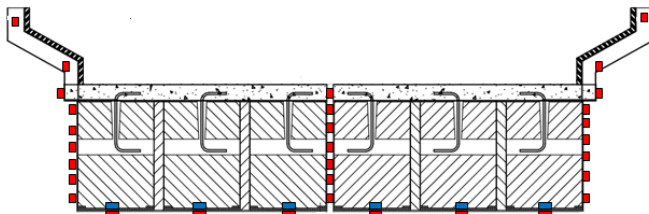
Cross Section showing Integral Concrete Fin and Instrumentation on HCB Span
